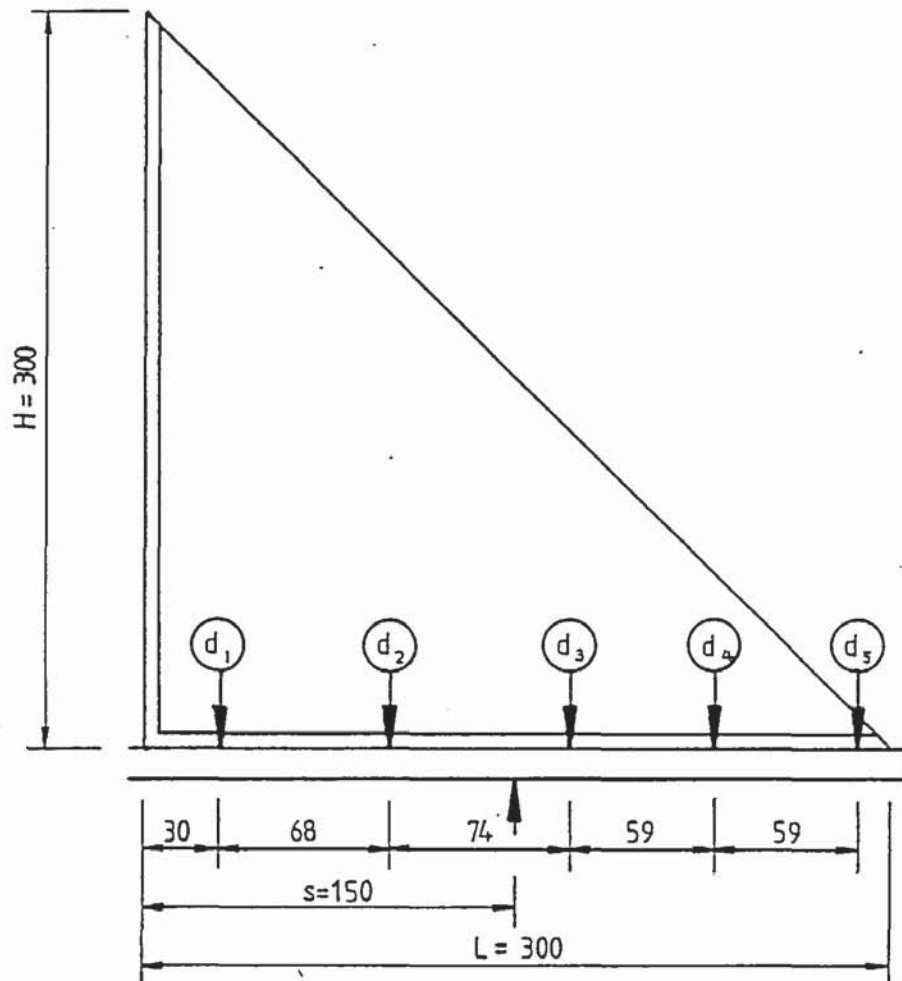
Extra dial gauge positions on loaded plate of specimen S7-10-150-1.
